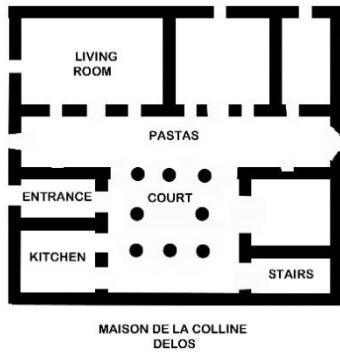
The plan of the House of Colline, 2nd century BC Mosaic floor of a house on Delos
